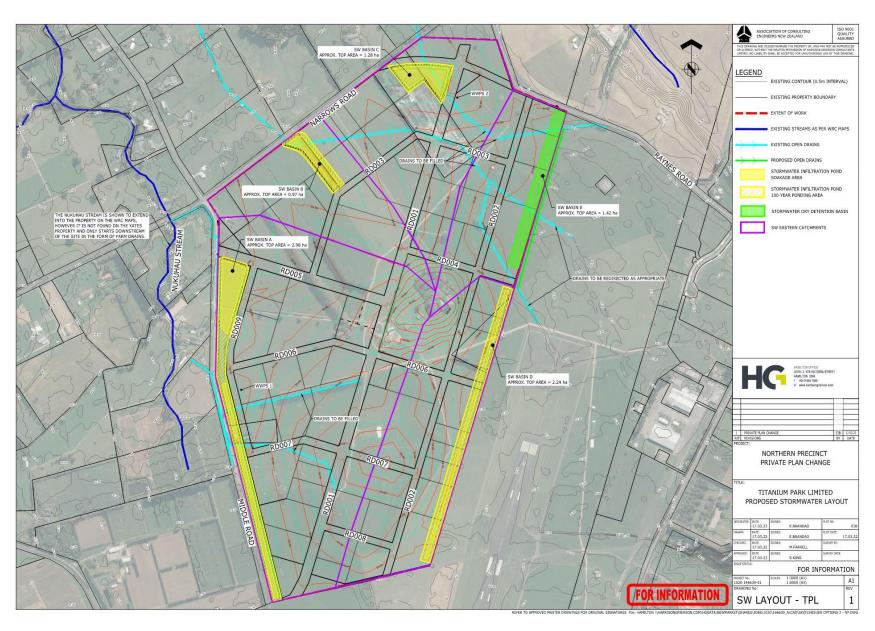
TPL BLOCK PROPOSED STORMWATER LAYOUT
